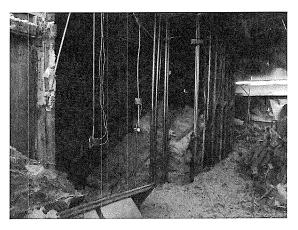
Interior view looking southwest towards entry bay and metal stairs to second floor. Photograph taken from second bay entry (photograph taken on 04/02/2018).
